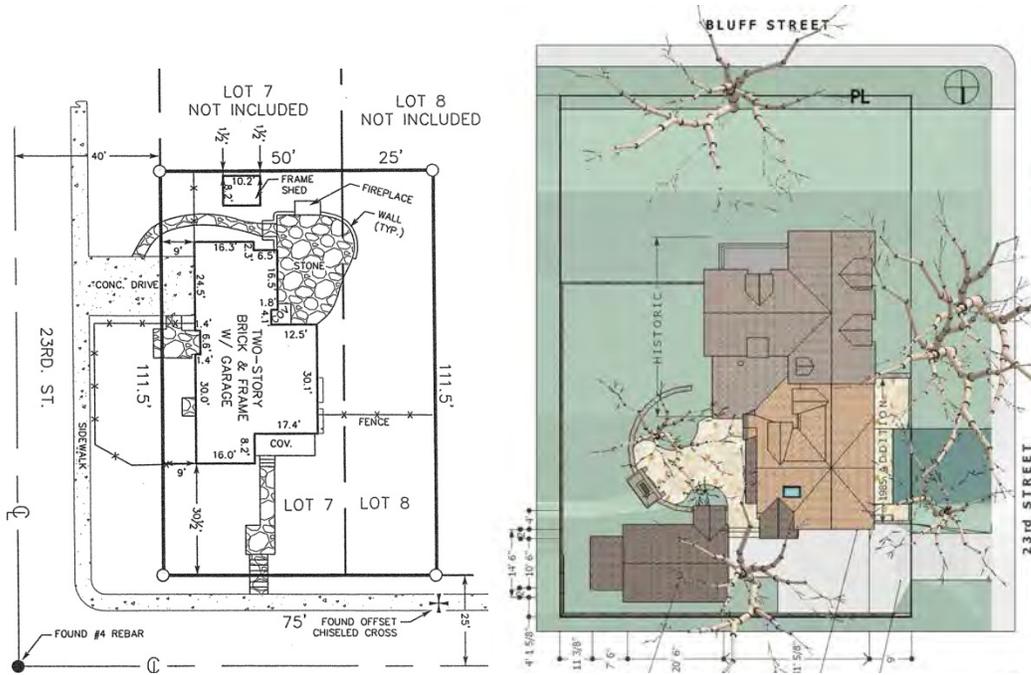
April 4<sup>th</sup>, 2015 (left) and Proposed Site Plans (right). Not to scale
